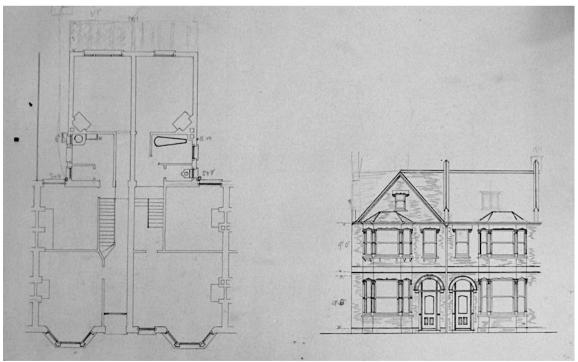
Drawing by Stone of proposed terraced houses, Bromley Road, built by Barley 1903, now a retail park (Prior Collection, Item 1514)
